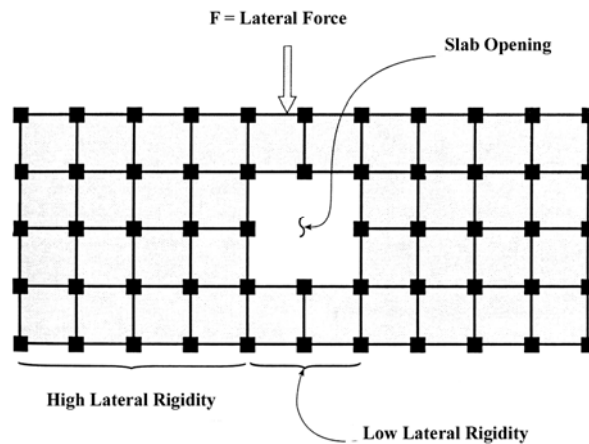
Discontinuities in the Floor Slab¹²⁵
